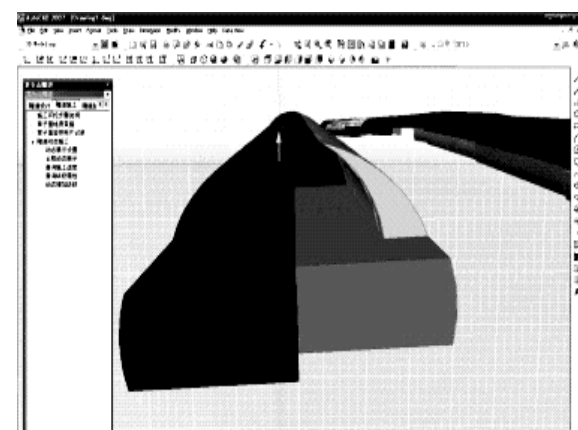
Visualization of surrounding rock excavation of Longtoushan tunnel.
